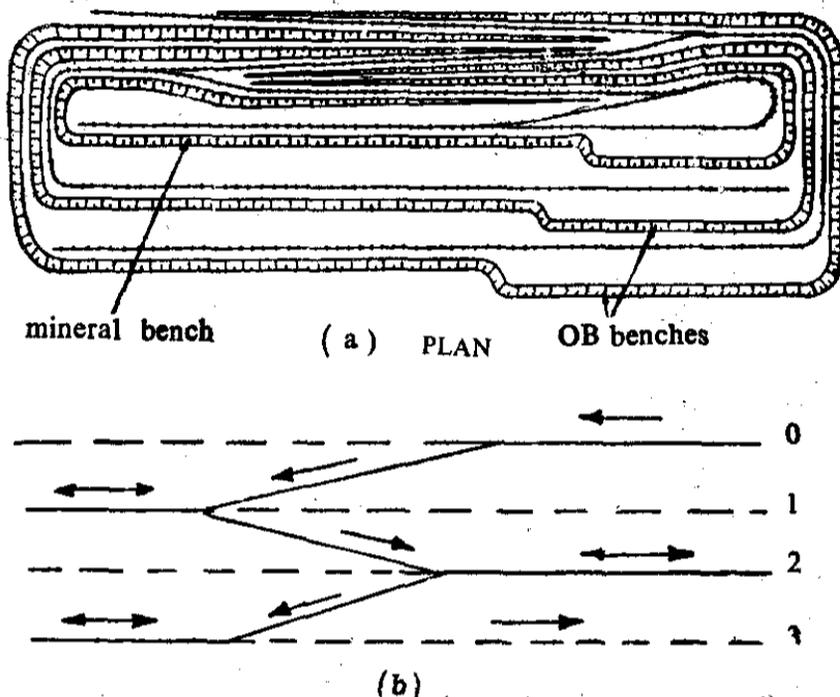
Switch back layout (Vertical section exaggerated).
